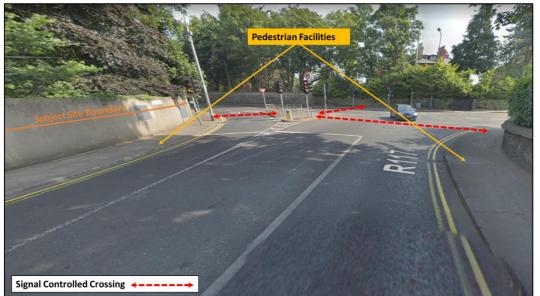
Existing Pedestrian Facilities along Milltown Road at junction with Sandford Road/Eglington Road
